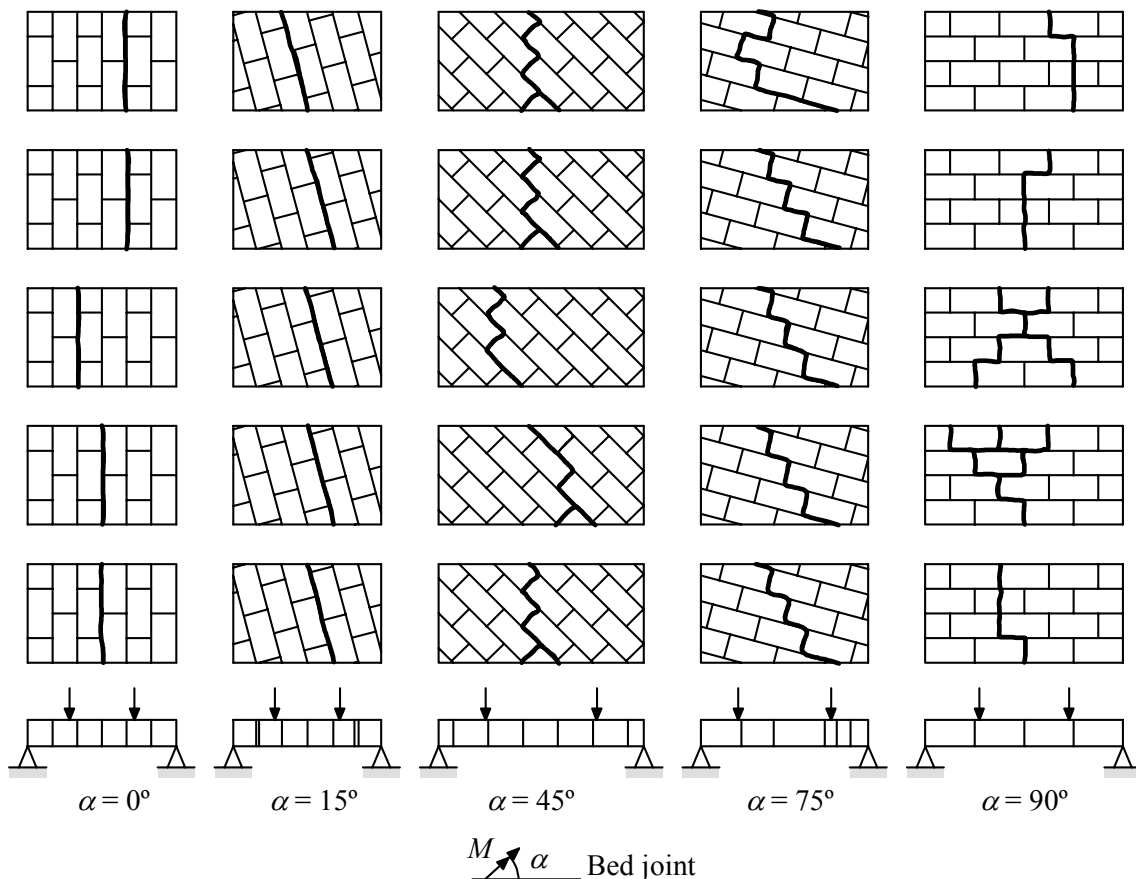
Failure patterns in masonry wallettes, Gazzola and Drysdale (1986)
